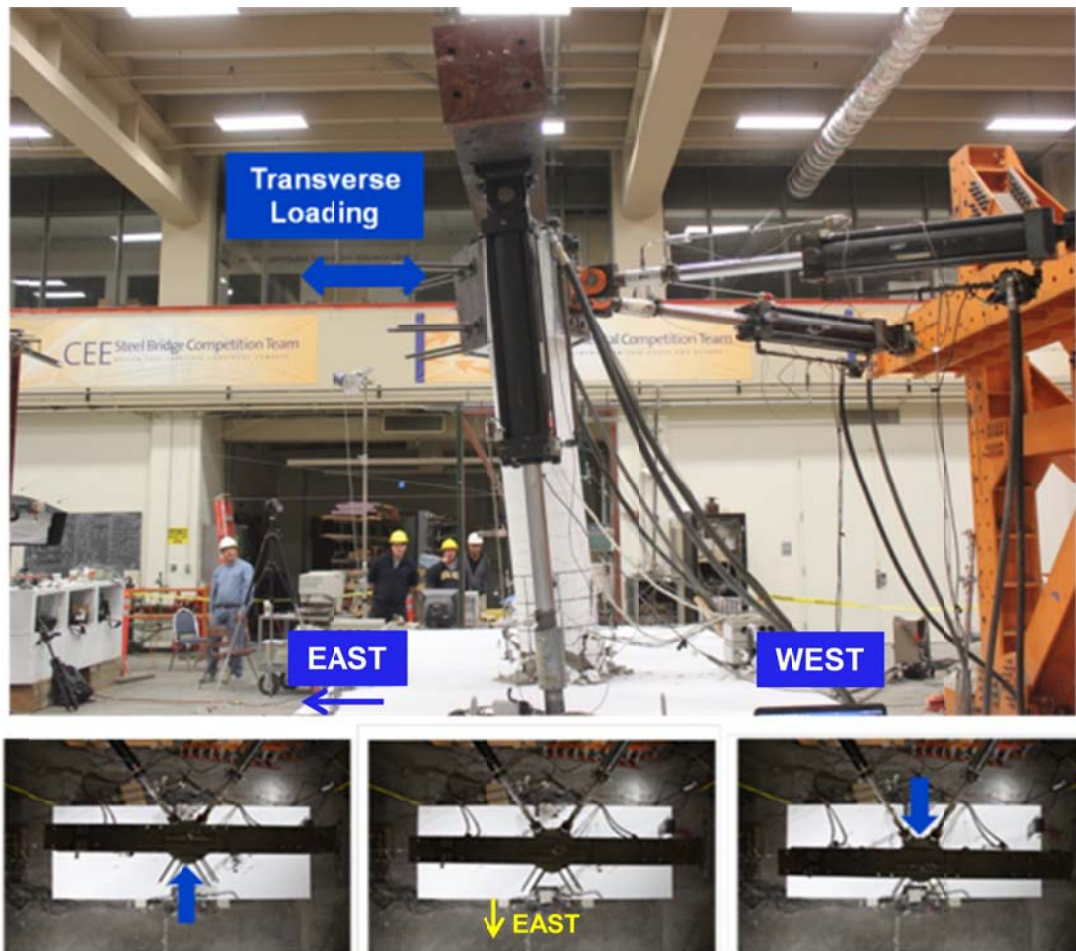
As-built SP1 test setup and progression of loading in the transverse direction
